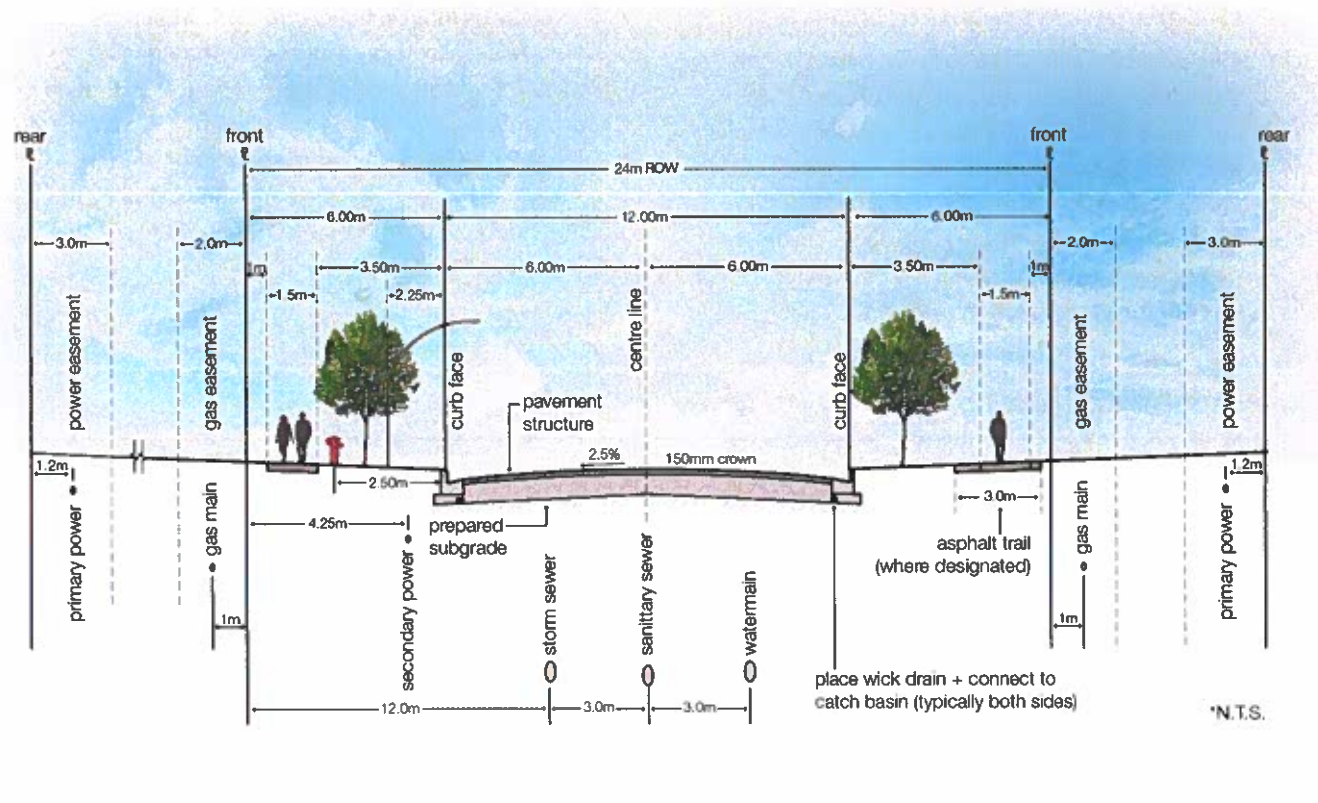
Conceptual Road Drawing of the Urban Village + Feature Park Area
